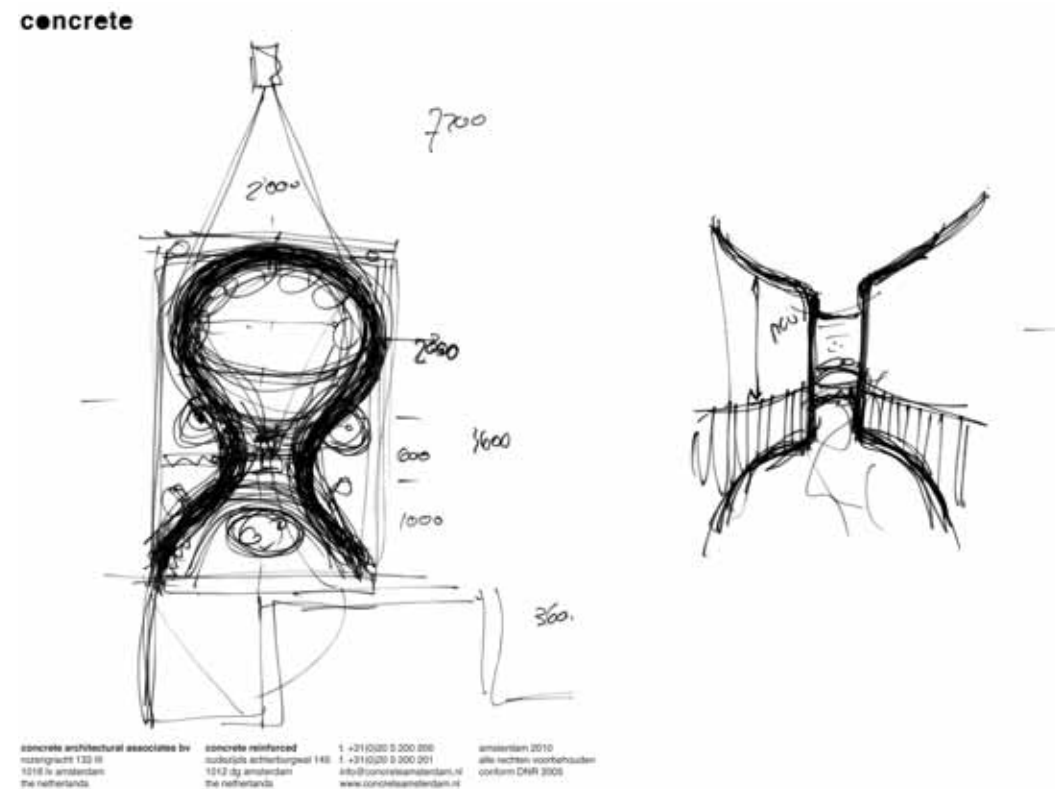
Sketch of Floor Plan and Perspective from Entrance of Window Brothel
